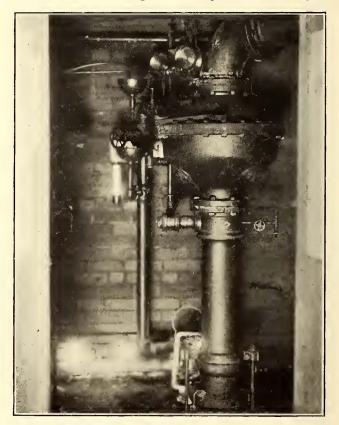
DRY PIPE VALVE IN ENCLOSURE BUILT ON OUT-SIDE OF CAR HOUSE, SHOWING ELECTRIC AND OIL LAMPS FOR HEATING
